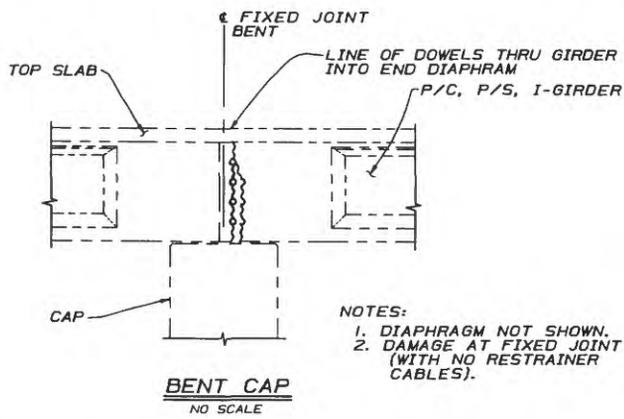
Detail drawing of typical damage to Napa River Bridge.
